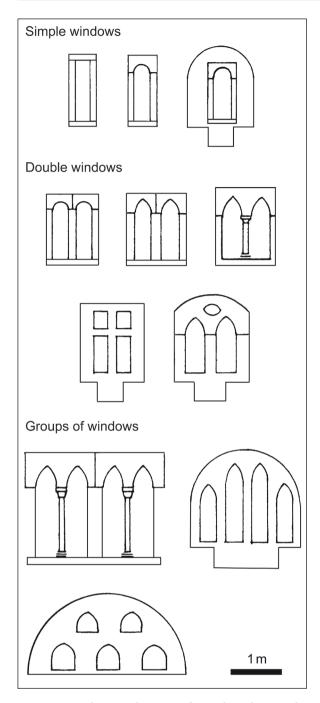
A schematic depiction of typical windows on the living floor of residential towers (after Krahe 2002b, Abb. 91; drawings: T. Korošec).
